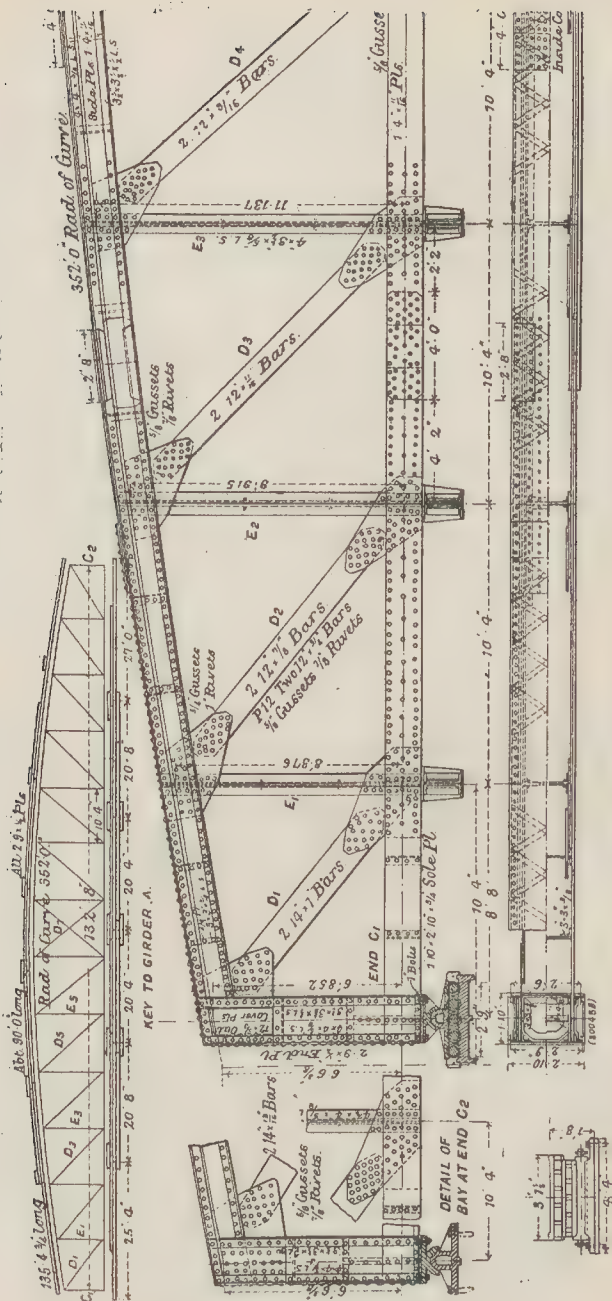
Hog-back 'N' Girder on L.B. and S.C. Railway.
